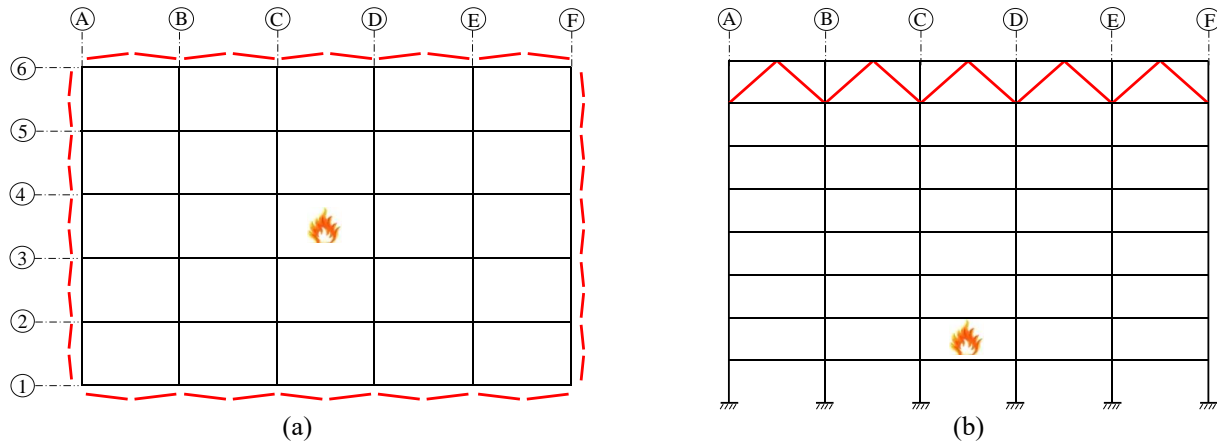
Layout of horizontal bracing system at perimeter of the top floor (Hat-perimeter): (a) plan view and (b) elevation view
